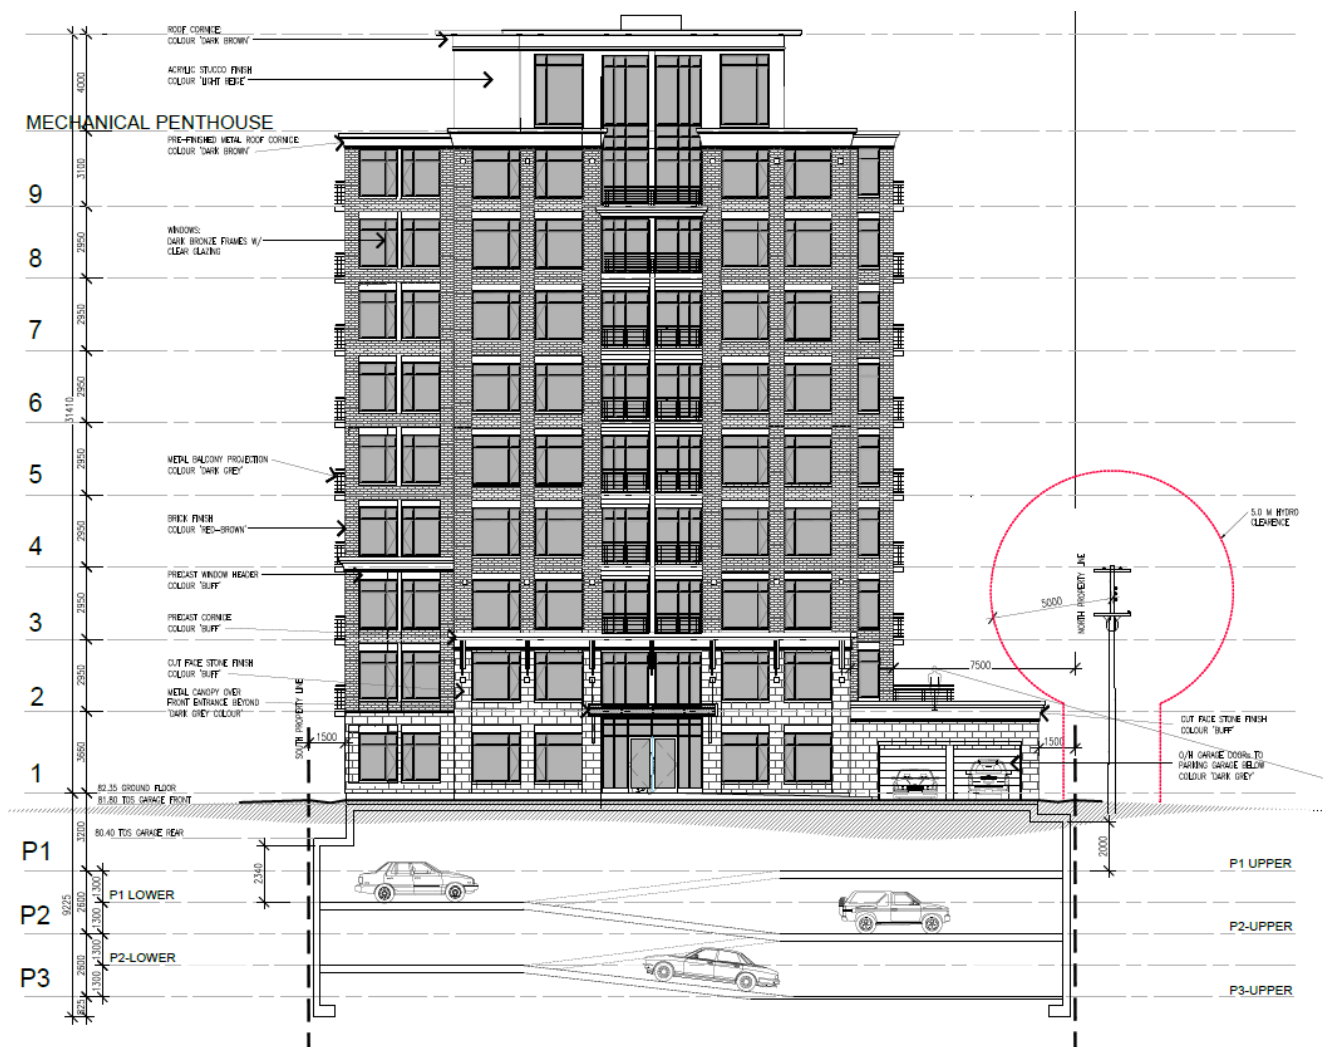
East elevation of the proposed development demonstrating the mechanical penthouse and underground parking entrance.
